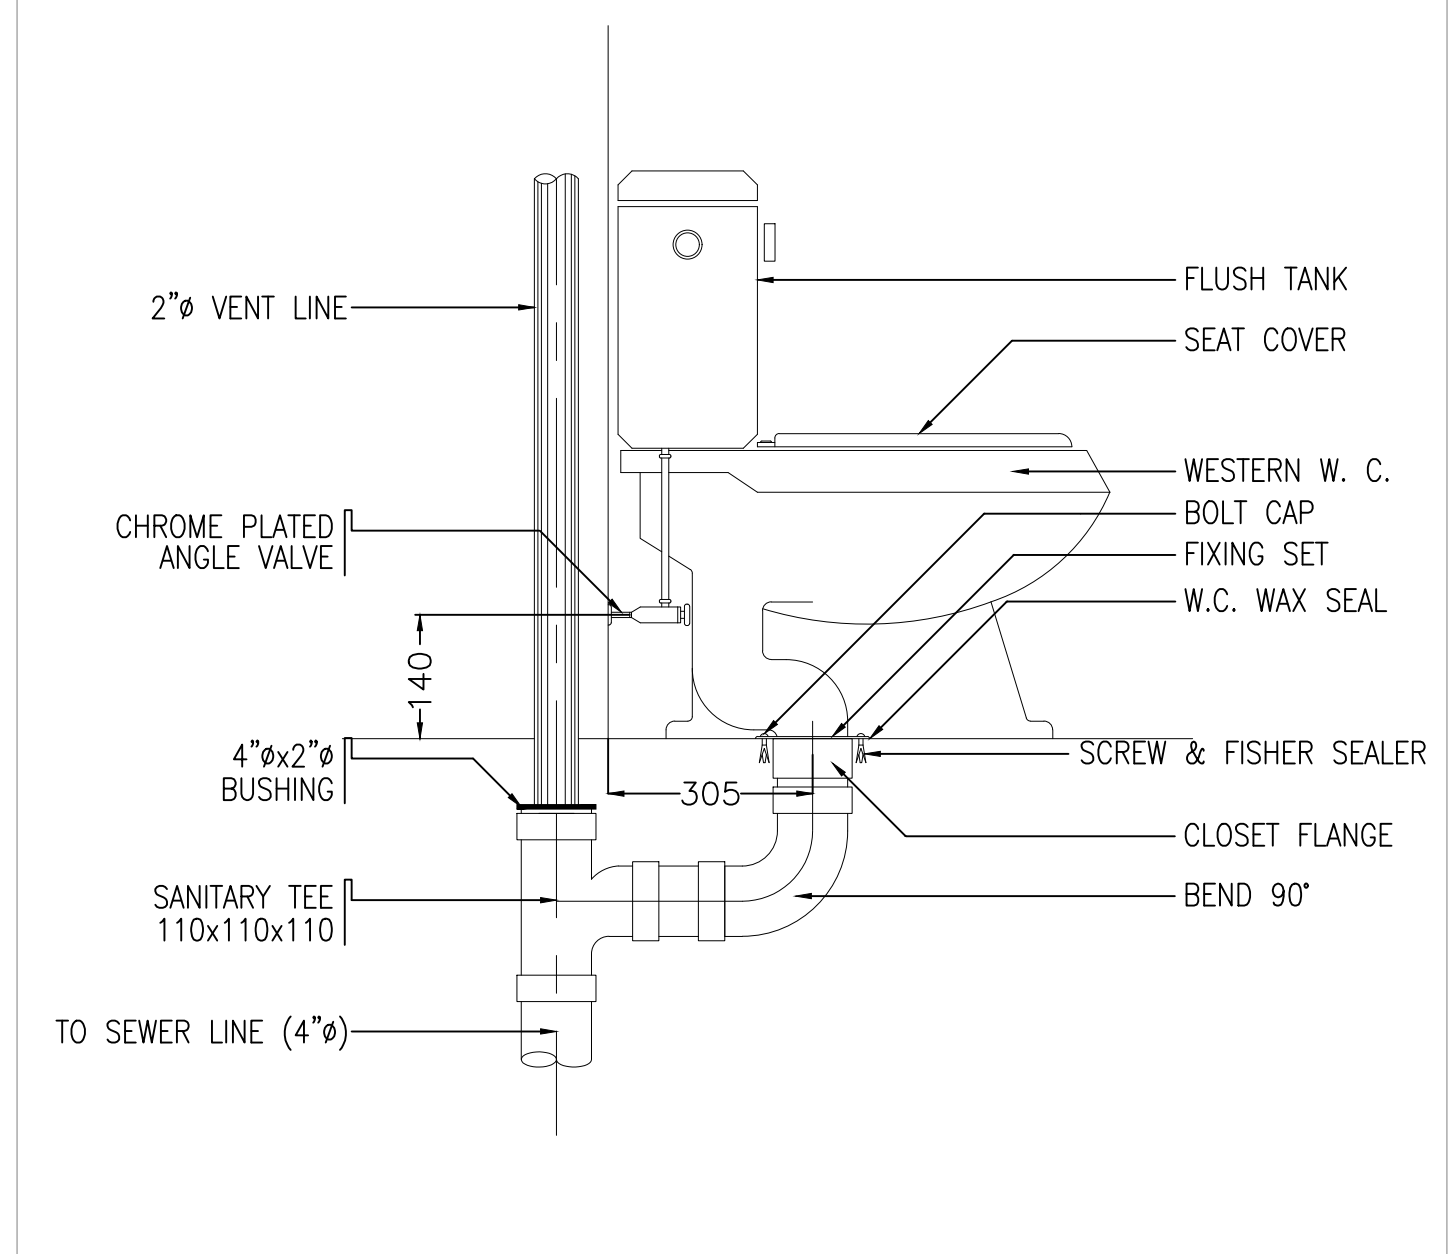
WESTERN WATER CLOSET (FLUSH VALVE) DETAIL
